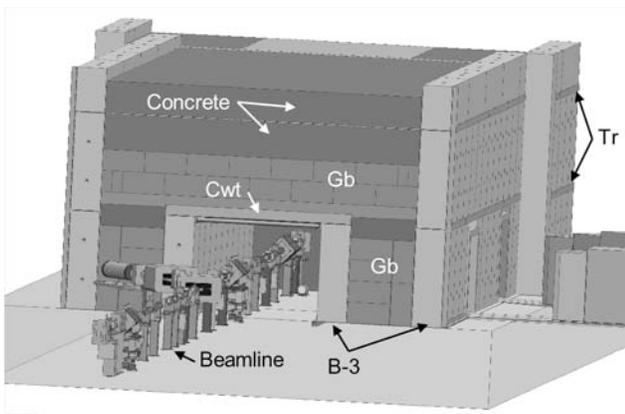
Cross-section of the beam tunnel. Cwt are counterweights, Gb are green blocks, and Tr are trusses.
